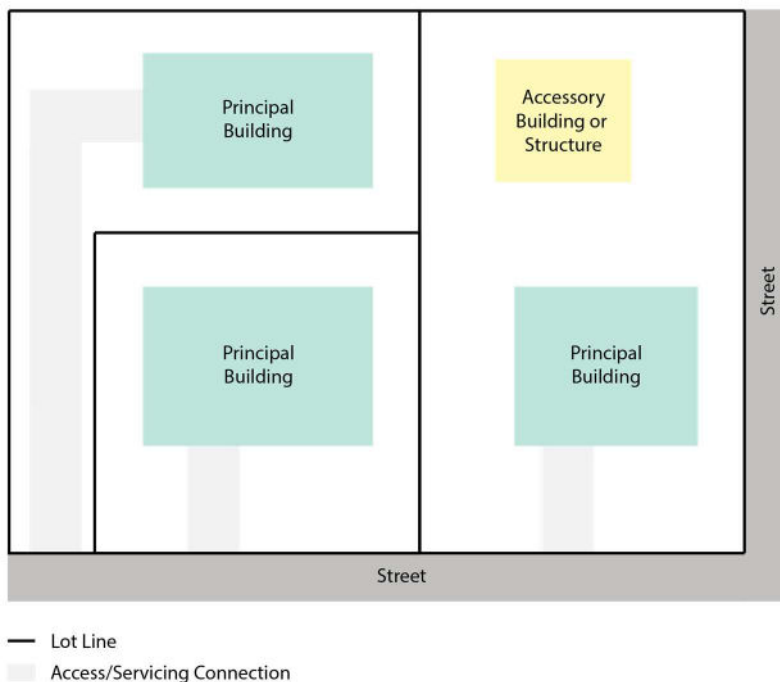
Diagram of Principal Buildings and Accessory Buildings or Structures
